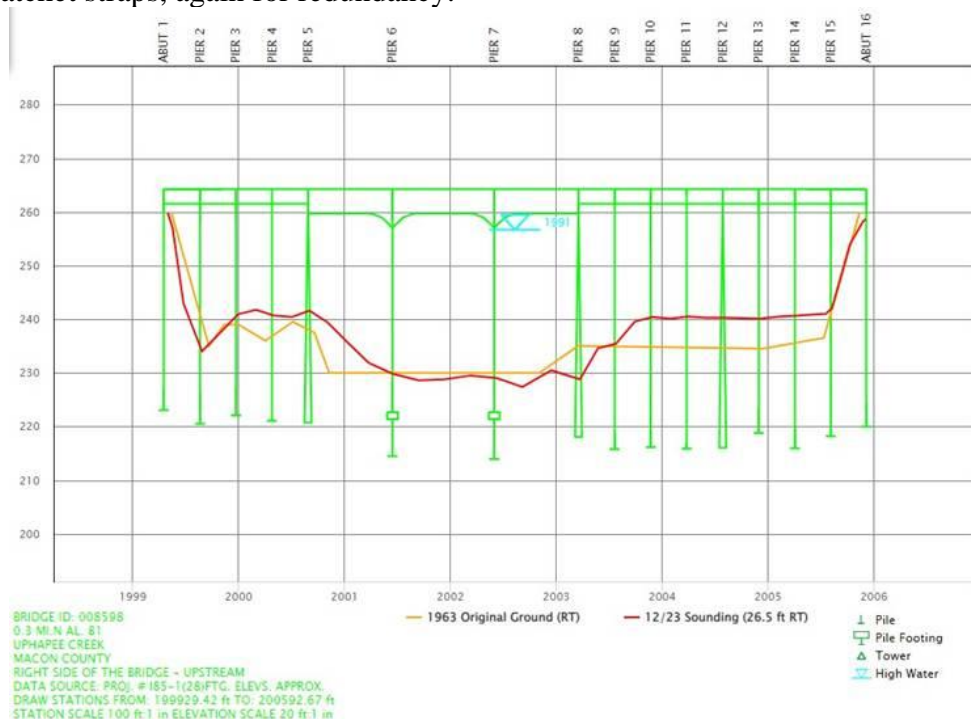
Cross-section of BIN 008598, Tuskegee, AL. Water flows in the direction into the page (source: AASHTOWare Bridge Management System).
